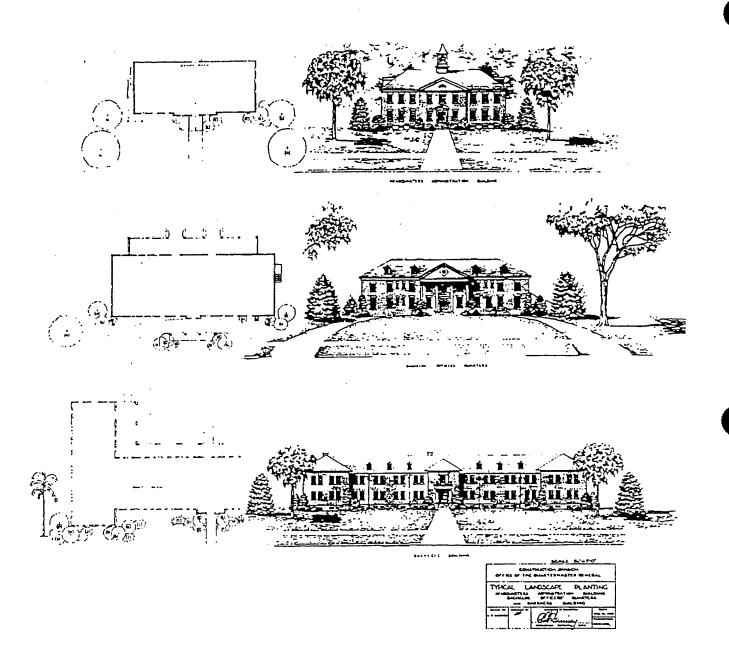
Typical Landscape Planting Plans for Headquarters Administration Building, Bachelor Officers' Quarters and Barracks Buildings. Source: Office of History, Headquarters, U.S. Army Corps of Engineers, Alexandria, VA.
